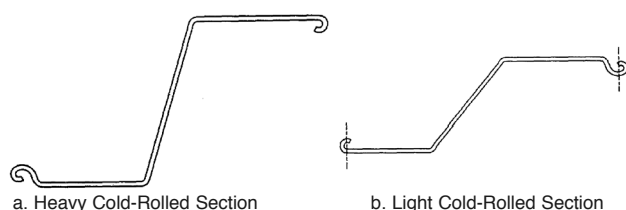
Typical Cold-Rolled Sheet Piling Sections
